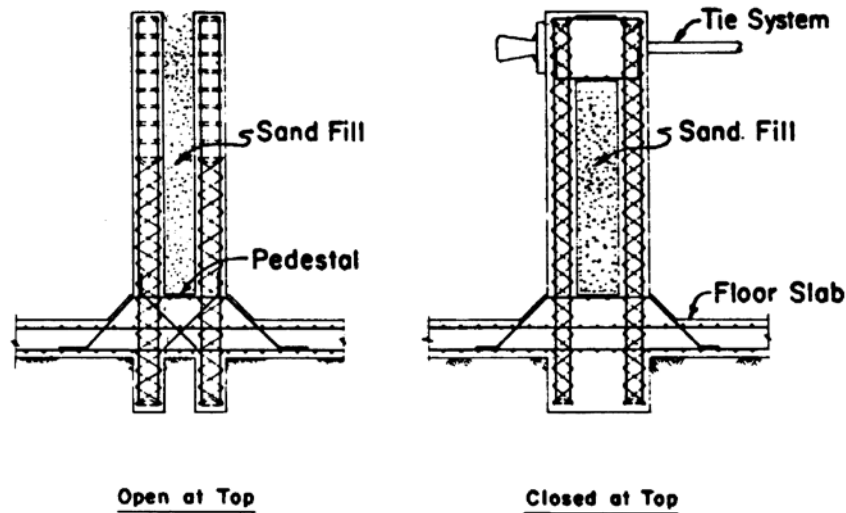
Blast barriers consist of two reinforced concrete panels and a sand infill. (U.S. Department of the Army, 1990)
